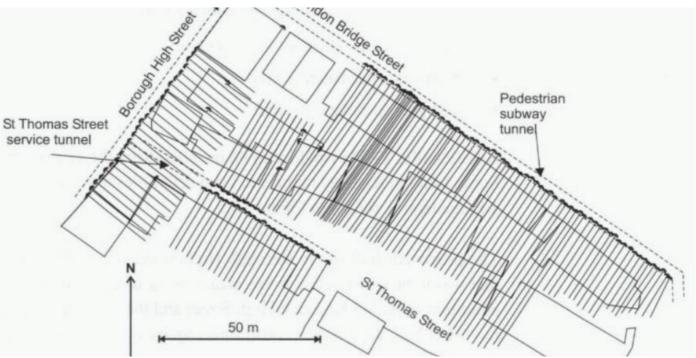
Plan of space with TAM locations in relation to the proposed site
